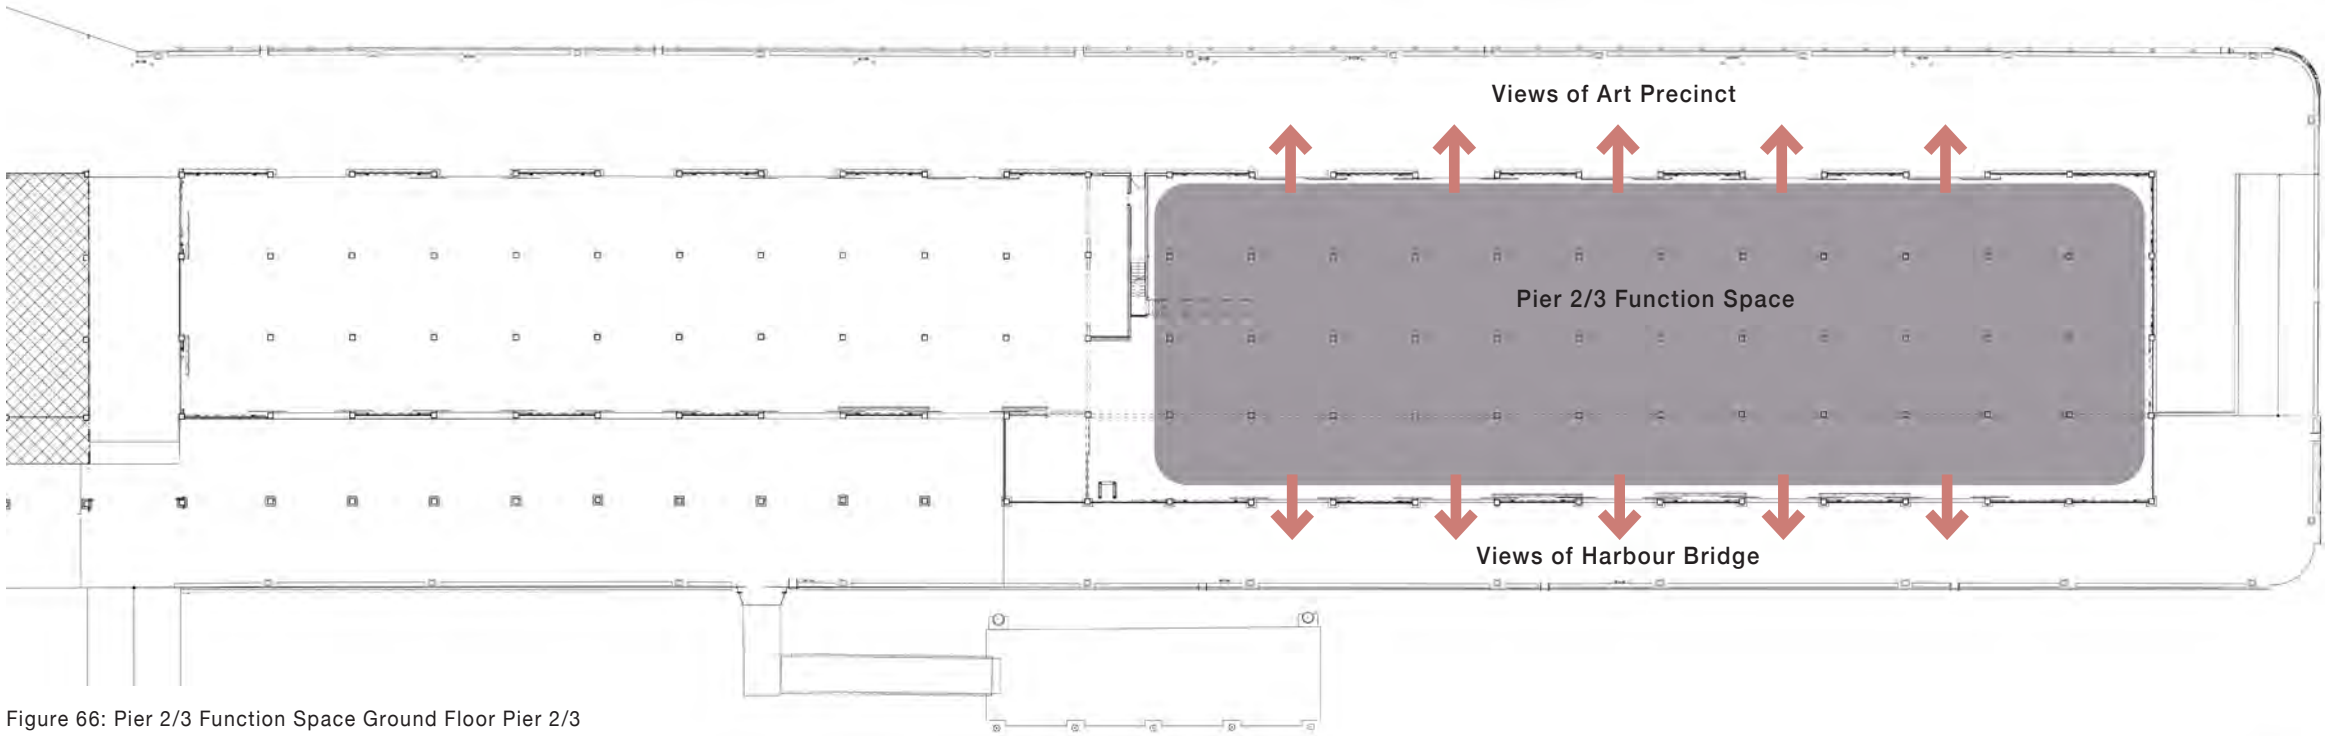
Pier 2/3 Function Space Ground Floor Pier 2/3
